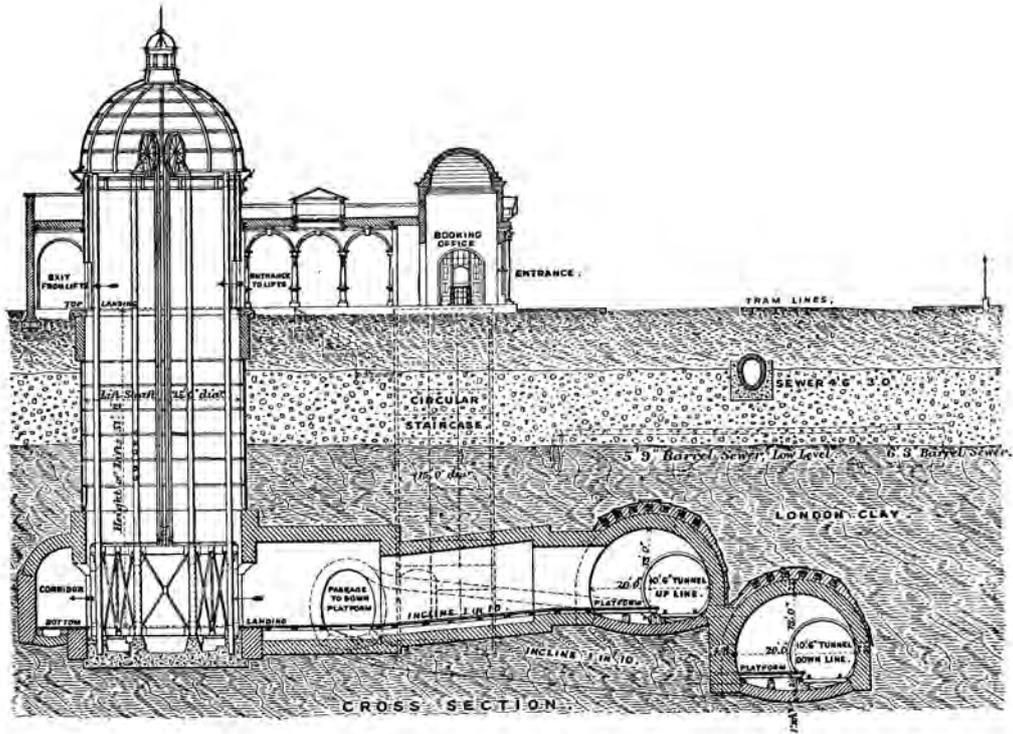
CITY AND SOUTH LONDON RAILWAY.
